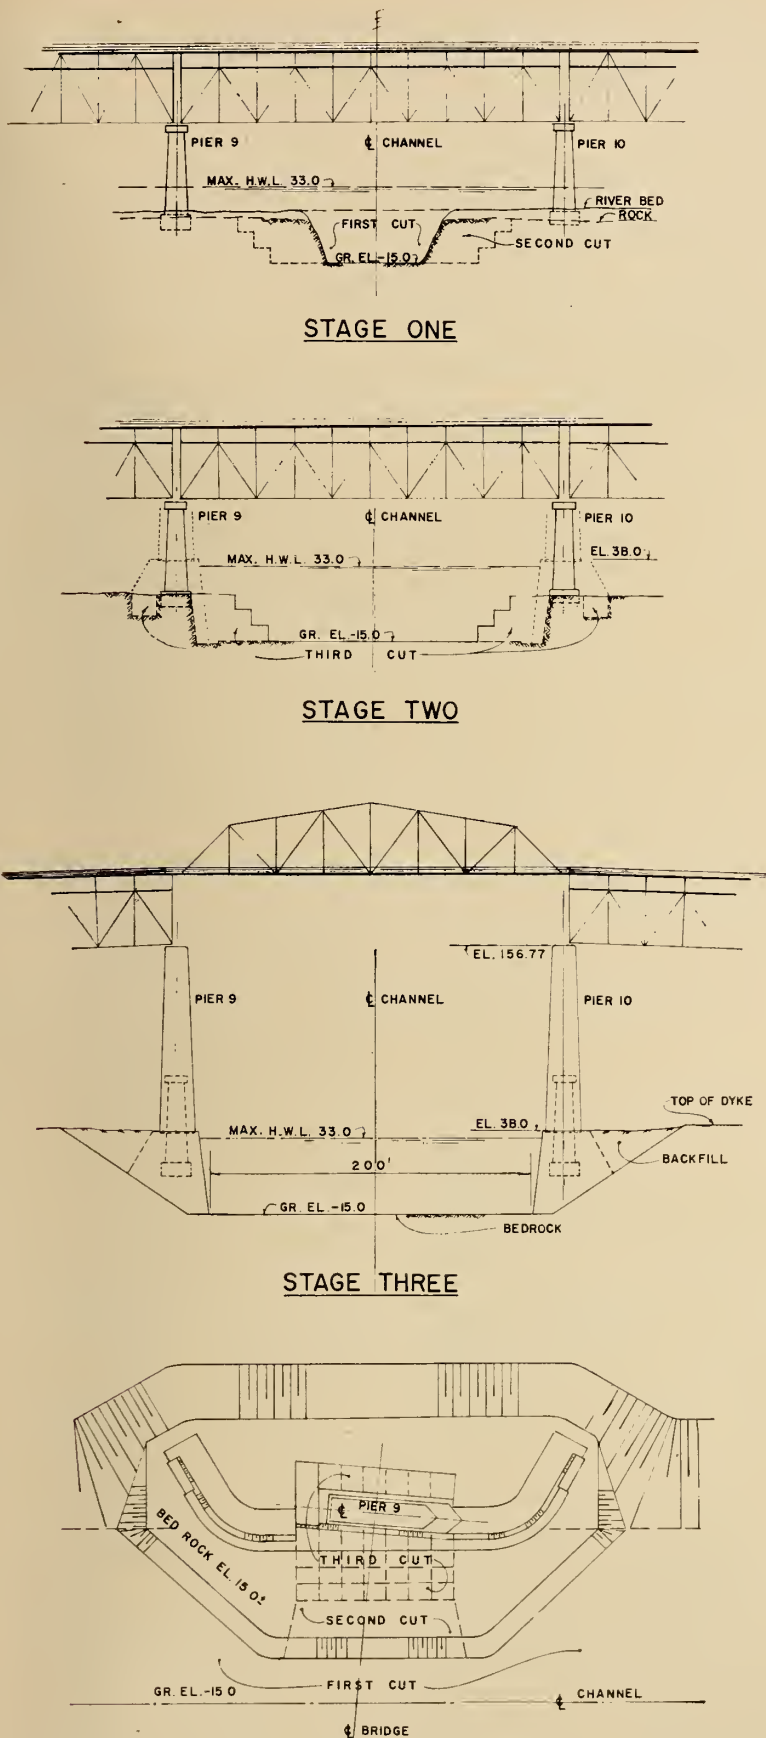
Jacques Cartier bridge, pier enlargement and channel excavation.
